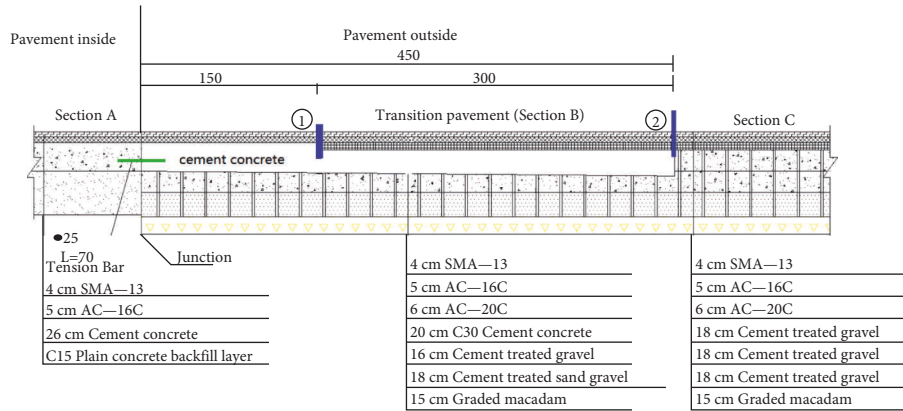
Pavement structures in the entrance and exit sections of the Huangjiayu tunnel (Str-1).
